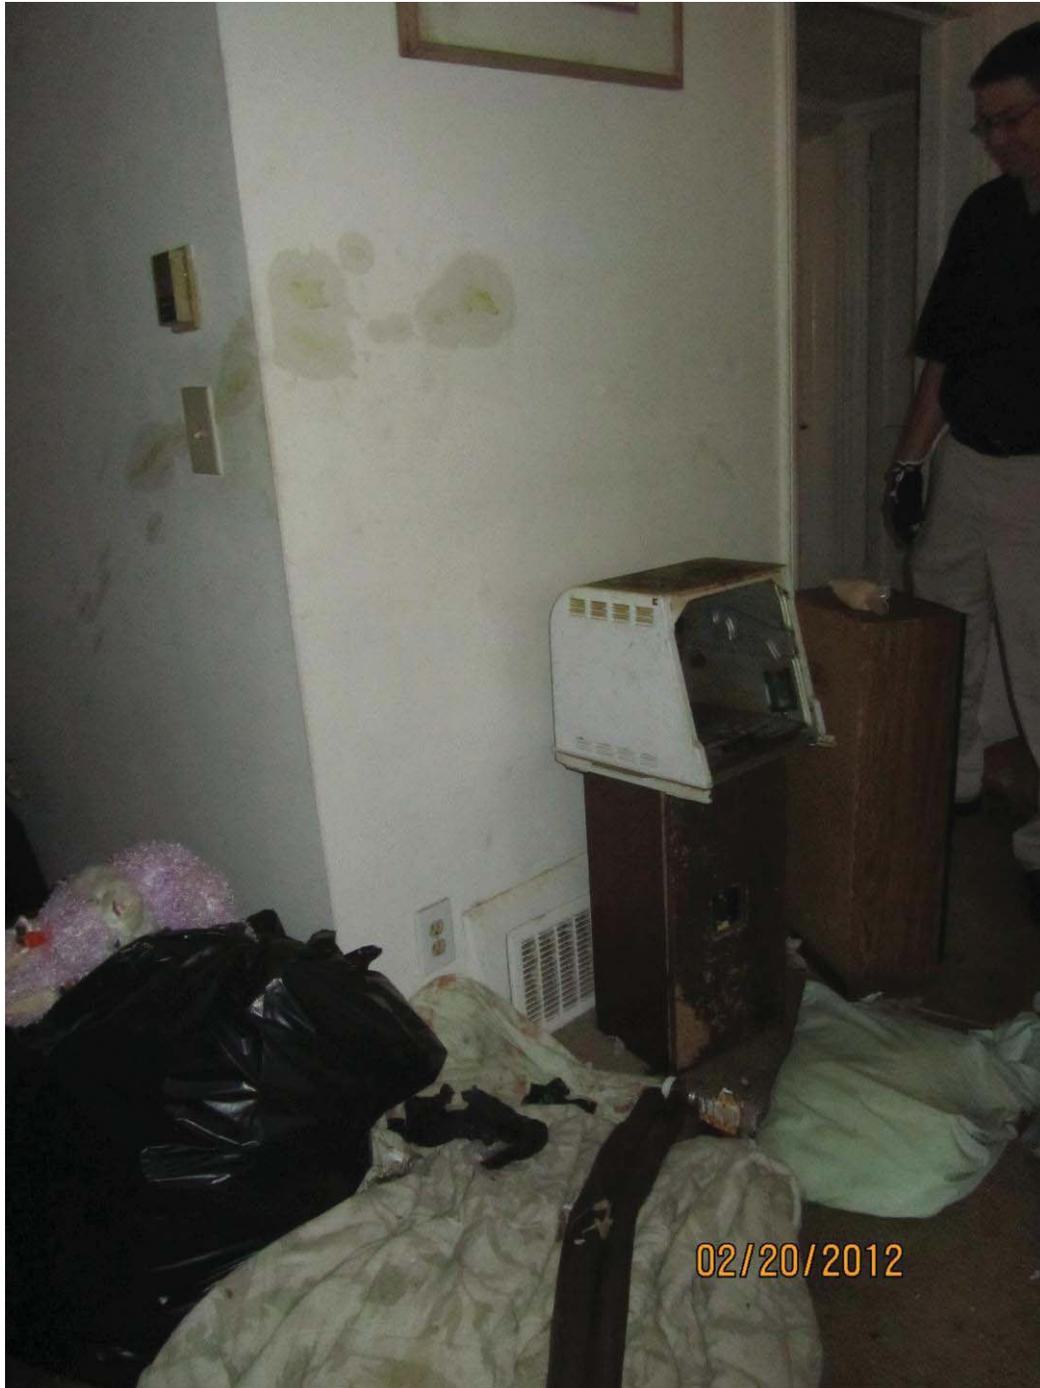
Mold in walls. Functionally obsolete wall heaters.
